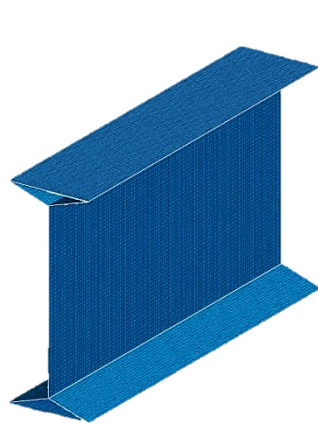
Hollow Flange and Open Cold-formed Steel Beams
